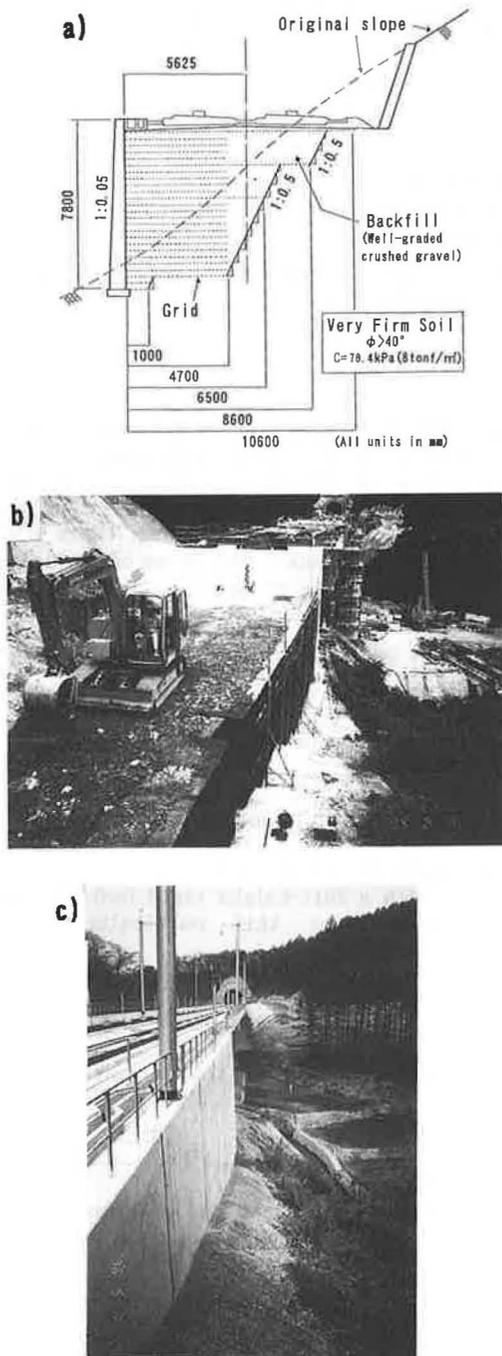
a) Typical cross-section, b) view of the wall under construction and c) view of the completed wall; a GRS-RW completed in 1995 for Hokuriku Shinkansen (bullet train), west of Karuizawa (No. 50 in Fig. 3)
